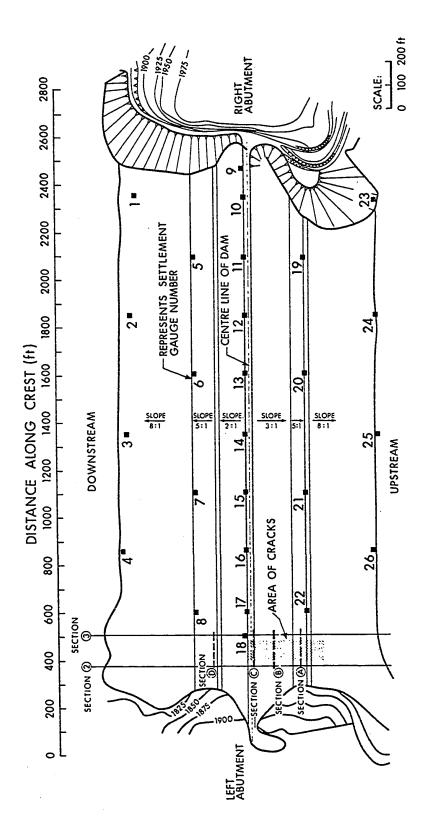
PLAN VIEW OF DUNCAN DAM SHOWING LOCATION OF SETTLEMENT GAUGES AND AREA OF CRACKS
